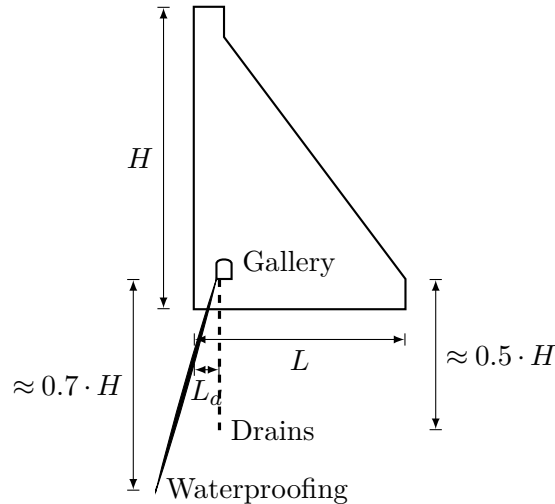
Waterproofing and drainage systems of the rock mass foundation.
